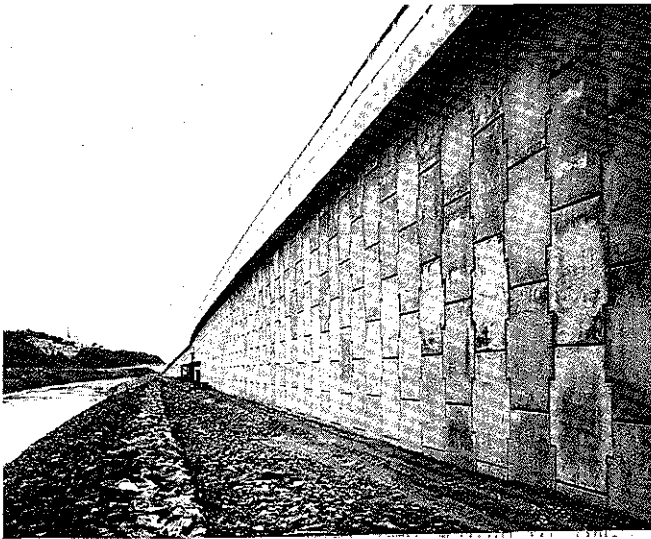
Reinforced Earth wall in Fremersdorf, view of completed wall
